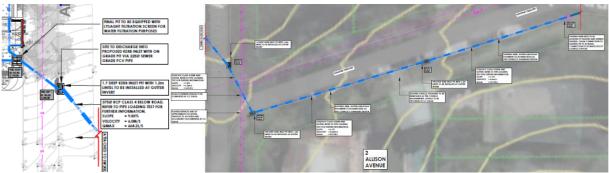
Extracts of revised stormwater drainage system to connect into Haldane Crescent Source: CSEG Group
